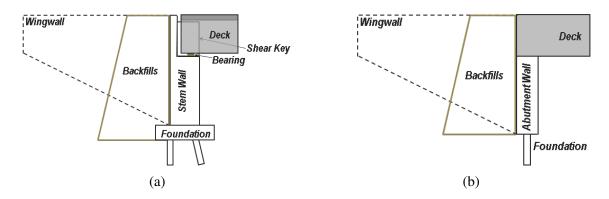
Examples of abutment in California bridges: (a) seat abutment, and (b) diaphragm abutment.
